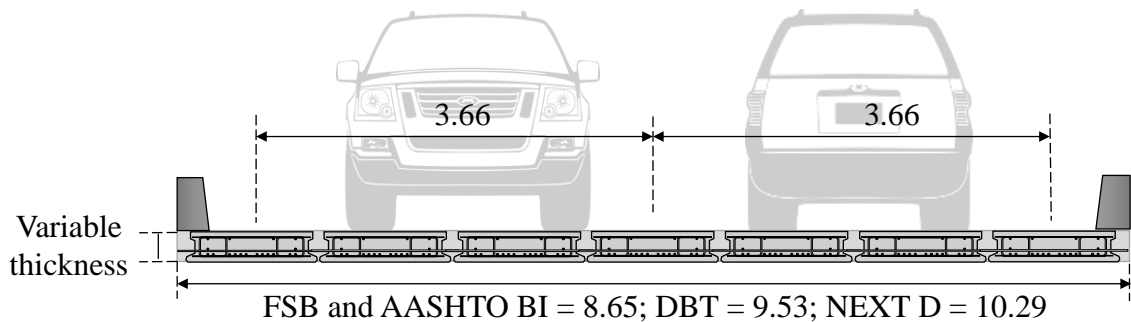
Example bridge using Florida Slab Beam (not to scale; units: m, 1 m = 3.281 ft.)
